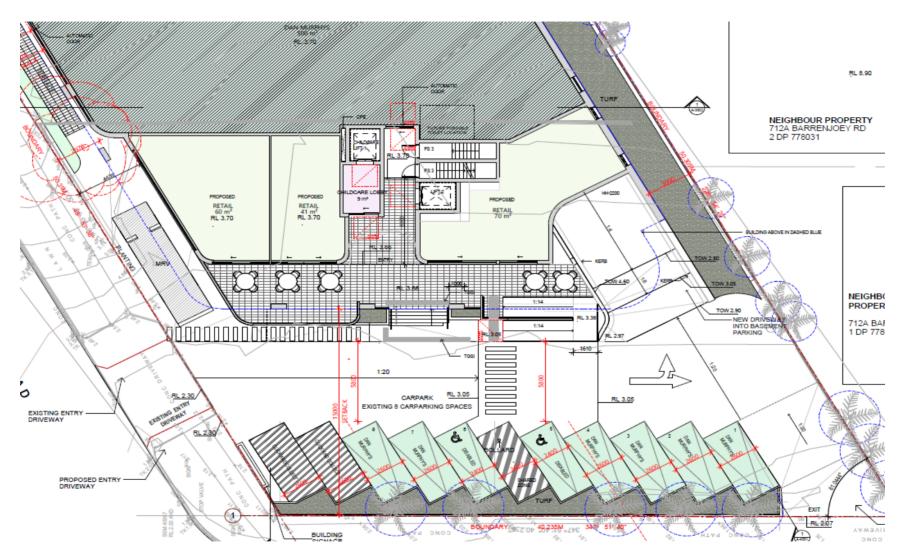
Proposed Retail Tenancies (Ground Floor)
